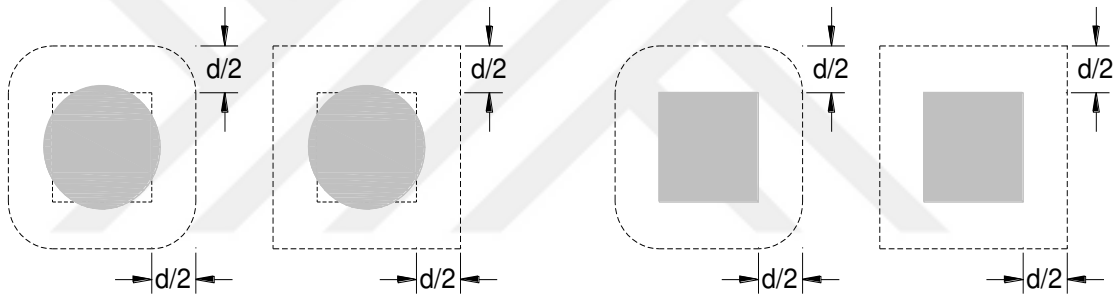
Critical section perimeter according to (American Concrete Institute 318-14, 2014).
